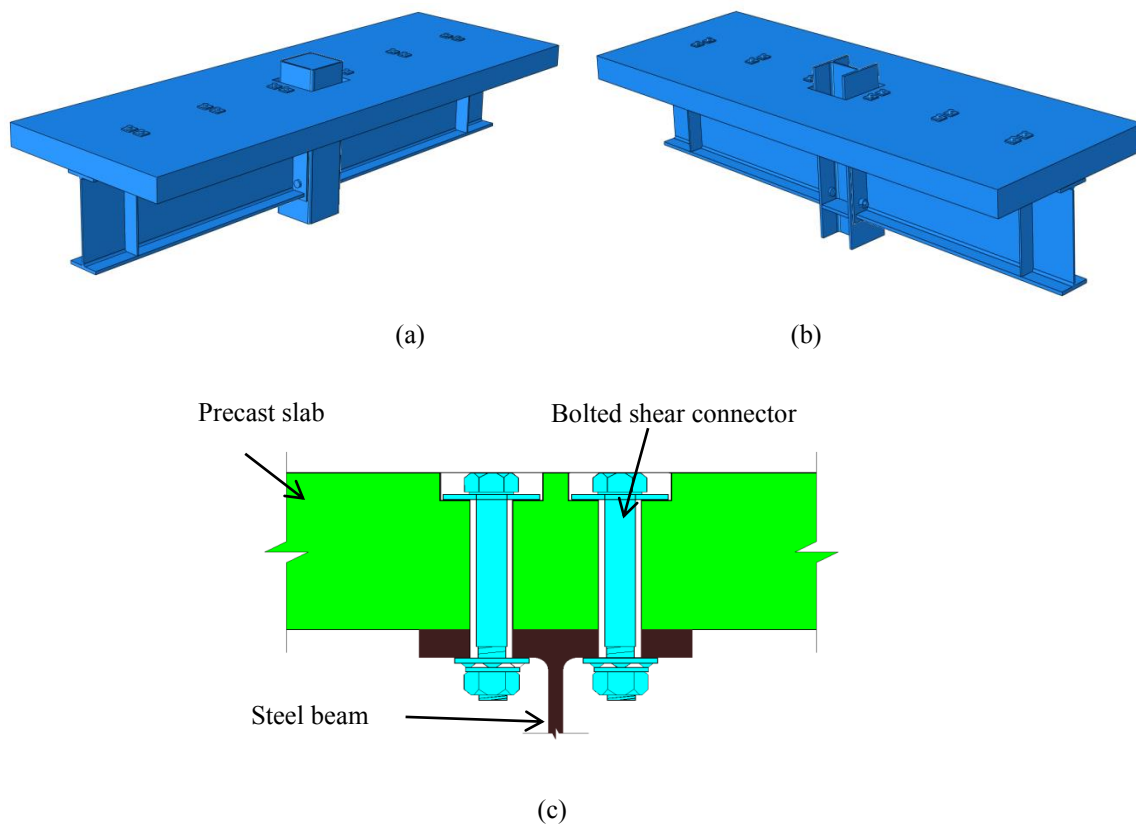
Schematic outline of deconstructable composite beam-to-column joint with flush end plate connection: (a) pictorial view of CJ1 and CJ2; (b) pictorial view of CJ3 and CJ4; (c) friction-grip bolted shear connection.
